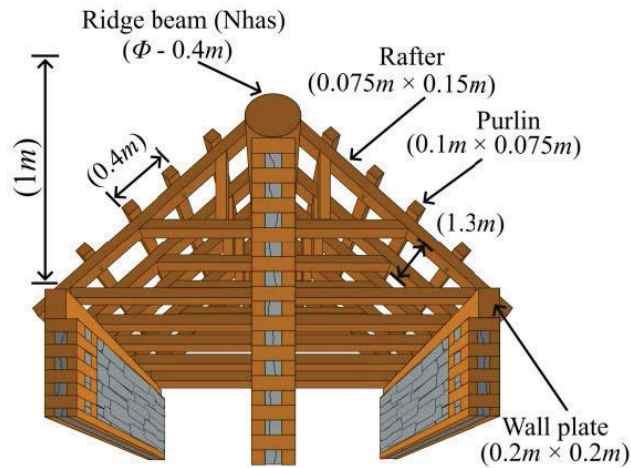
Typical sketch of the roof system in Thathara buildings
